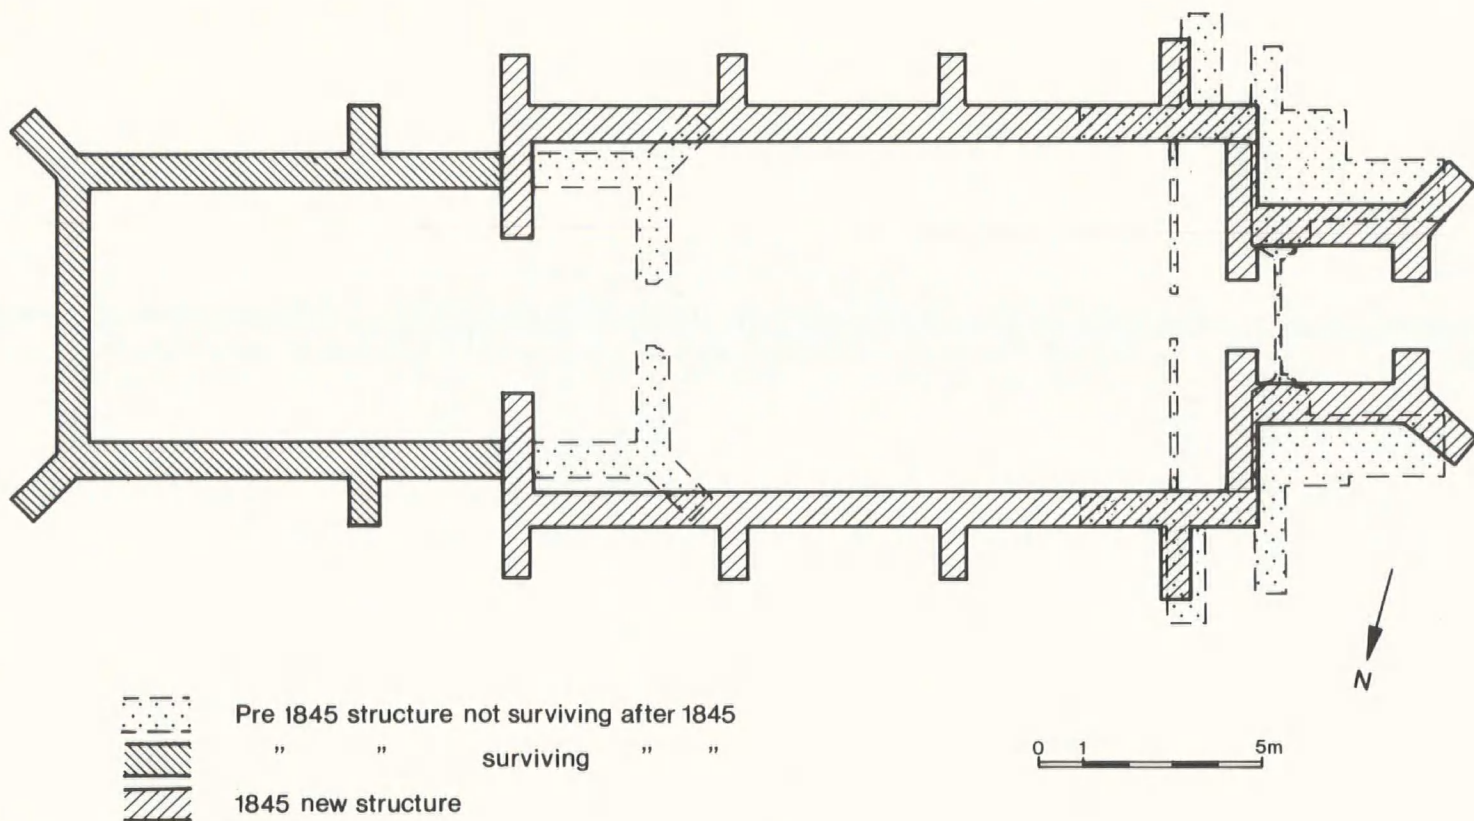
Plan of Pulloxhill church after rebuilding in 1845
